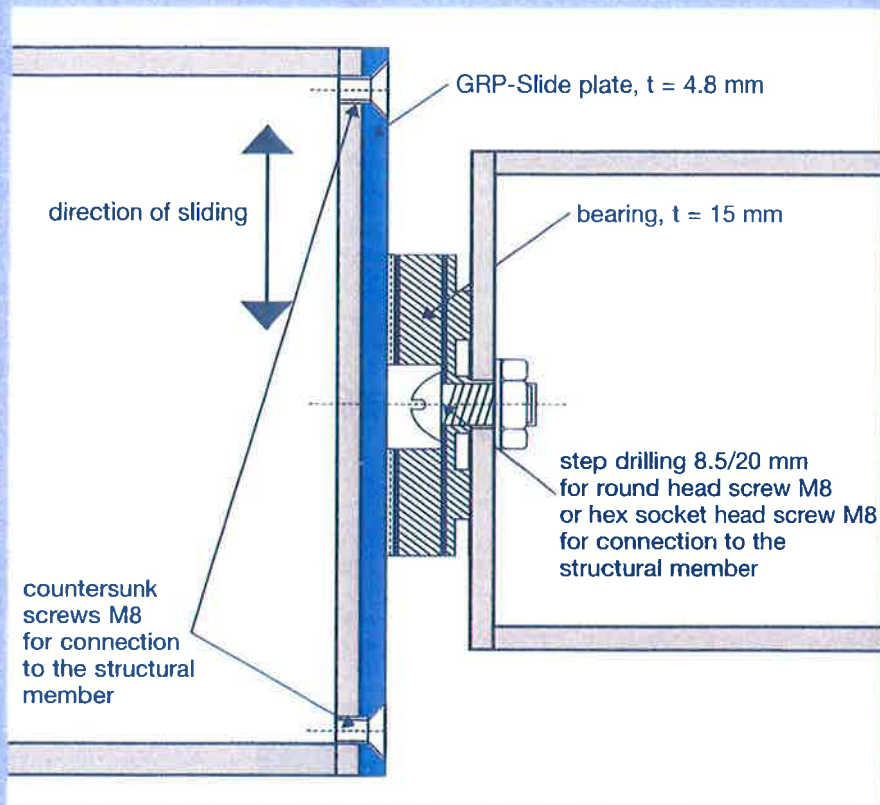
Example of a Ciperall® Sliding Bearing ST, $t = 20 \text{ mm}$, vertical joint between two structural steel members and connection of the individual bearing components to the adjacent structural members
